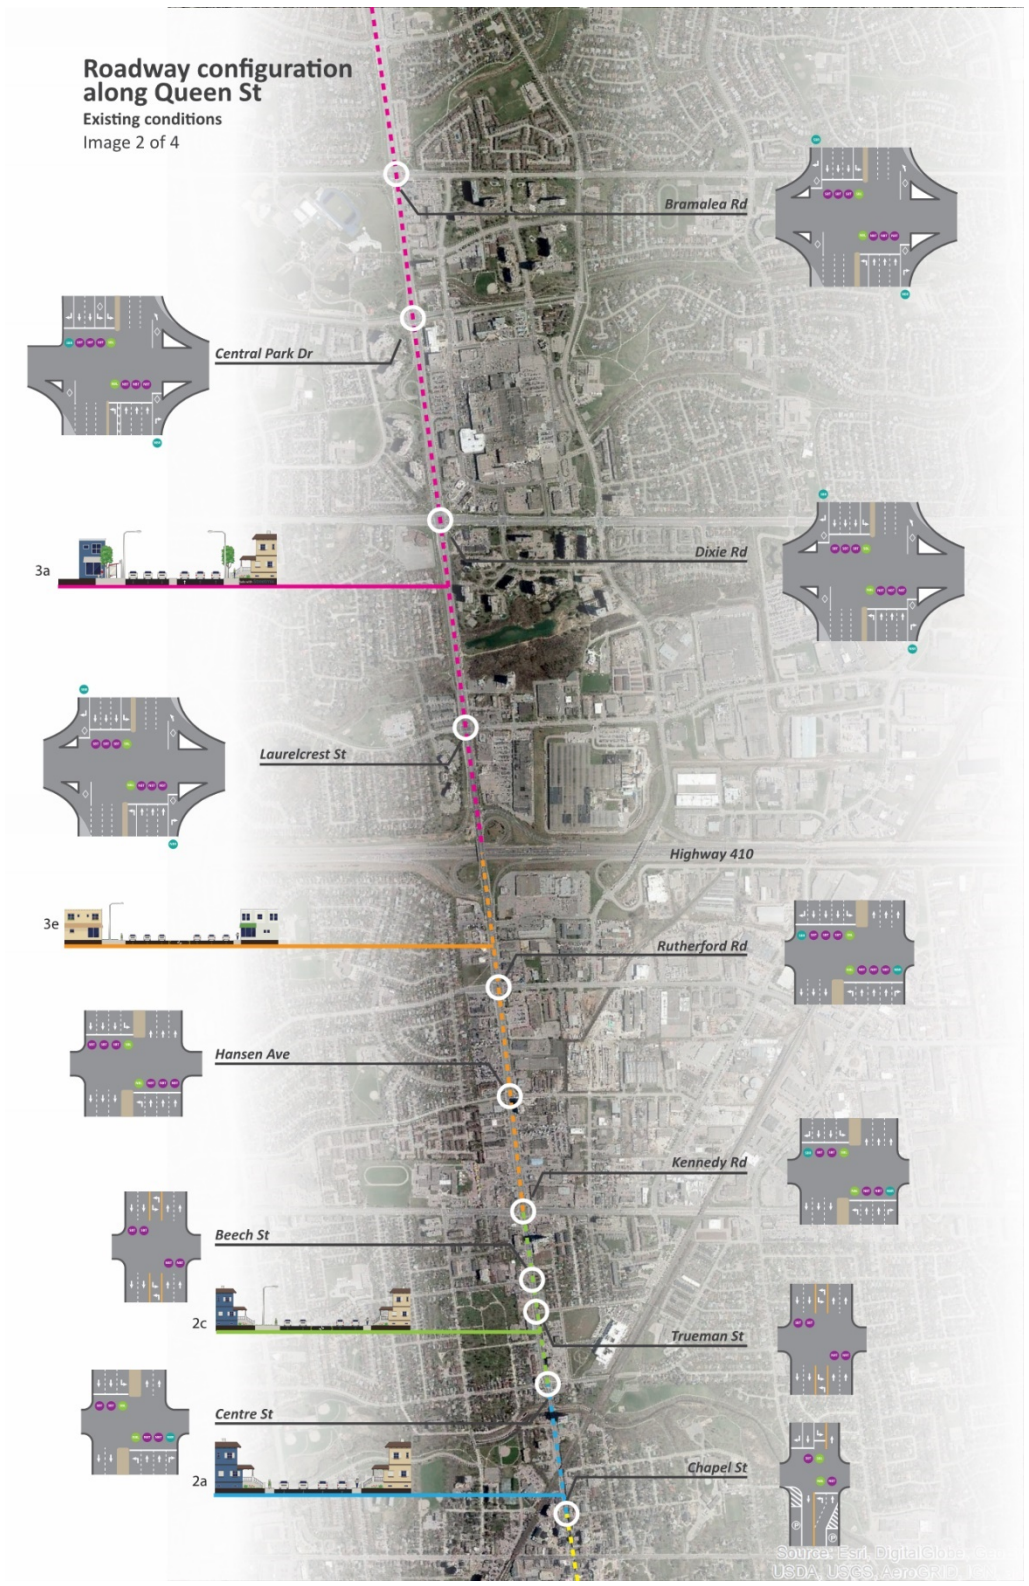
Roadway configuration along Queen Street, Chapel Street to Bramalea Road
